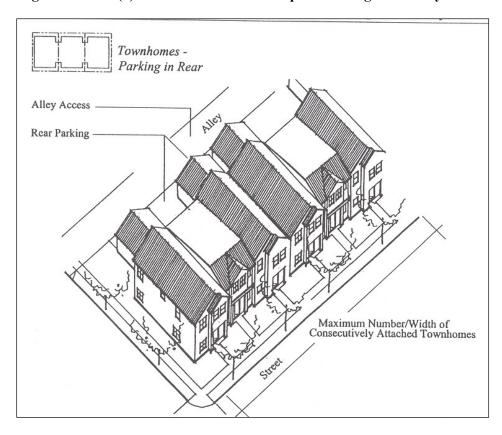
E(2) – Townhomes and Multiplex Housing With Alley Access
